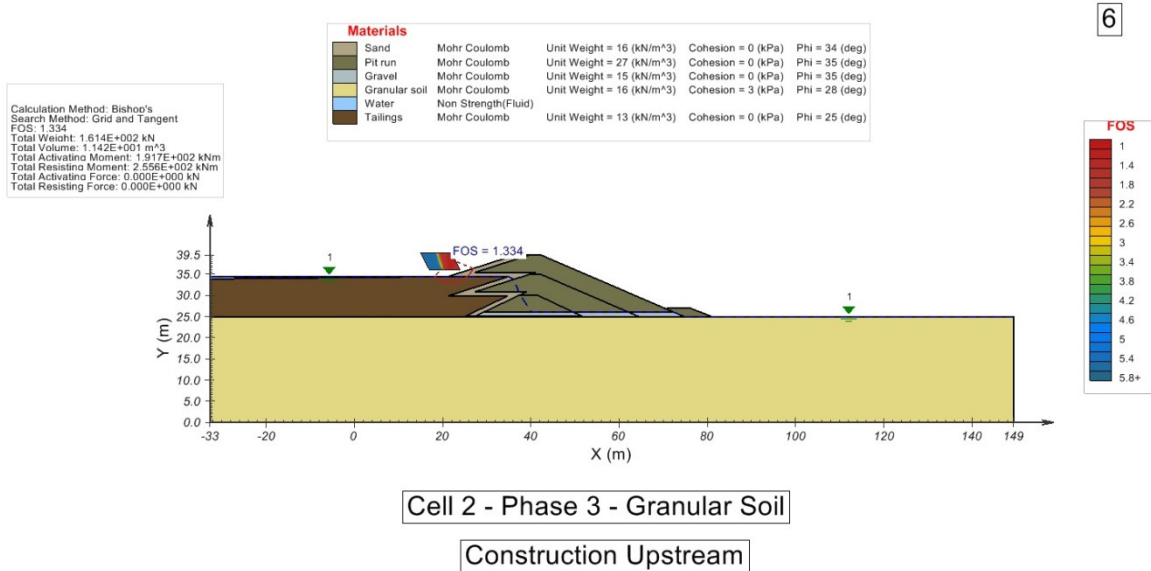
Maximum tailings dam cross section and stability factor of safety.
